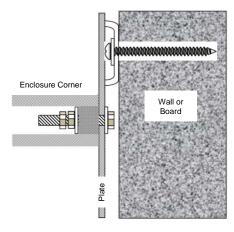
Fixing Orientation When Using the Optional Mounting Plate
